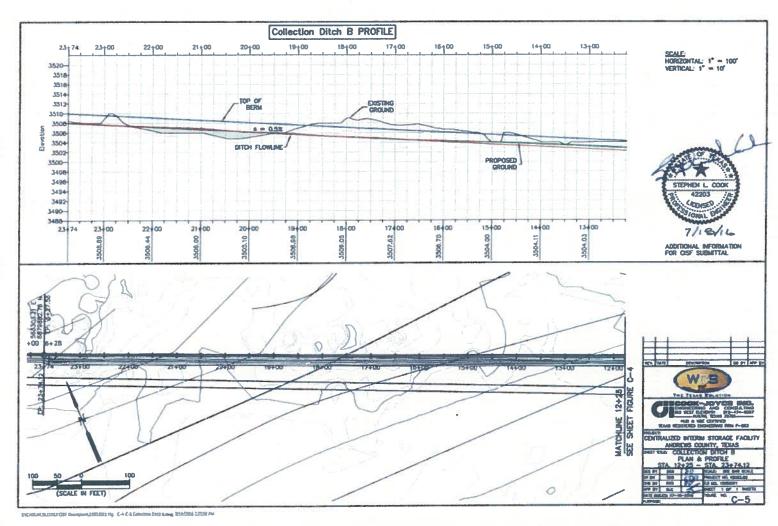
CJI C-5 Collection Ditch B Plan & Profile STA. 12+25 – STA 23+74.12
